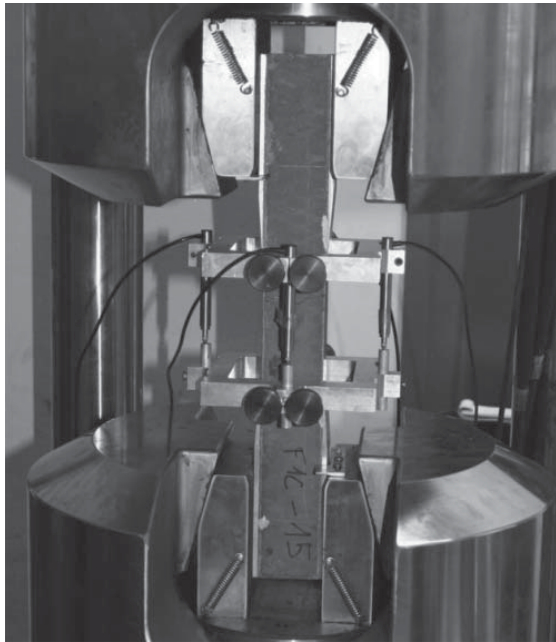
Testing of 431.8 mm (17 in.) long specimen.
